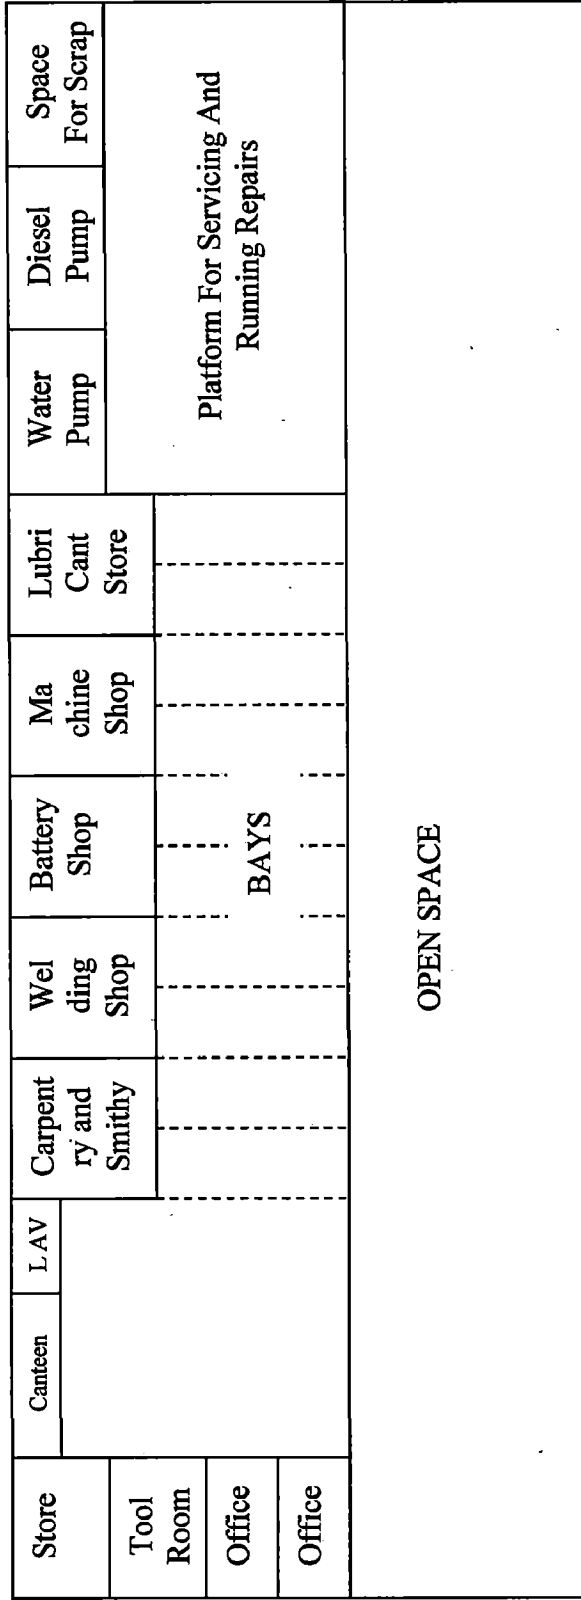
Layout Plan Of Field Workshop<sup>[1]</sup>
